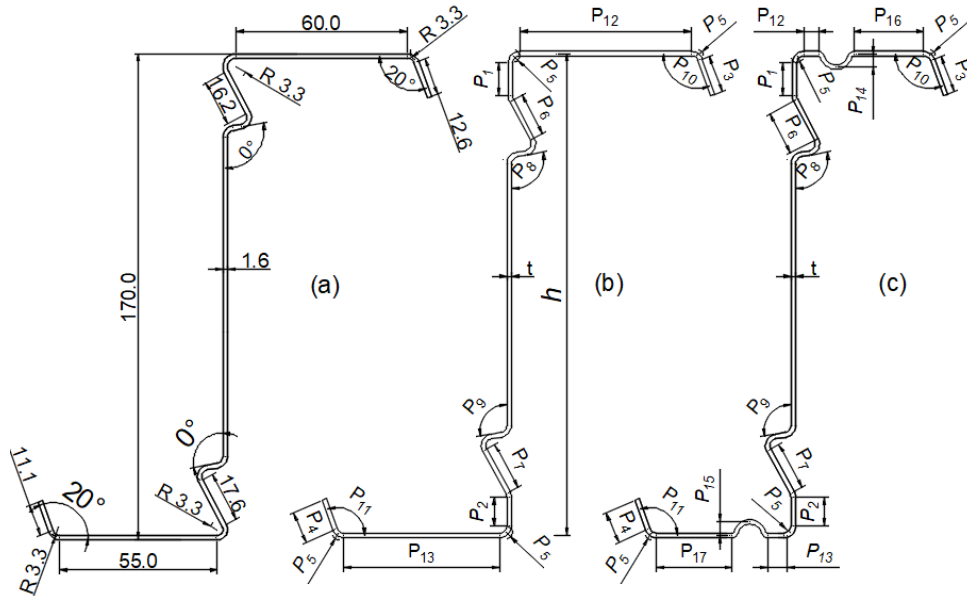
Dimension parameters in (mm) and definition of design variables of the zed cross section (a) reference section, (b) without flange stiffeners, and (c) with flange stiffeners
